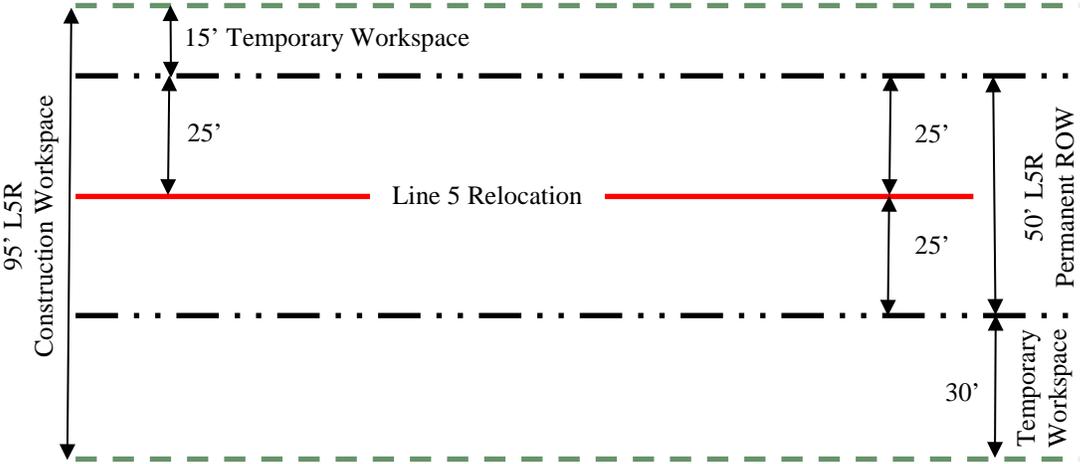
Typical Construction Workspace—Wetlands
